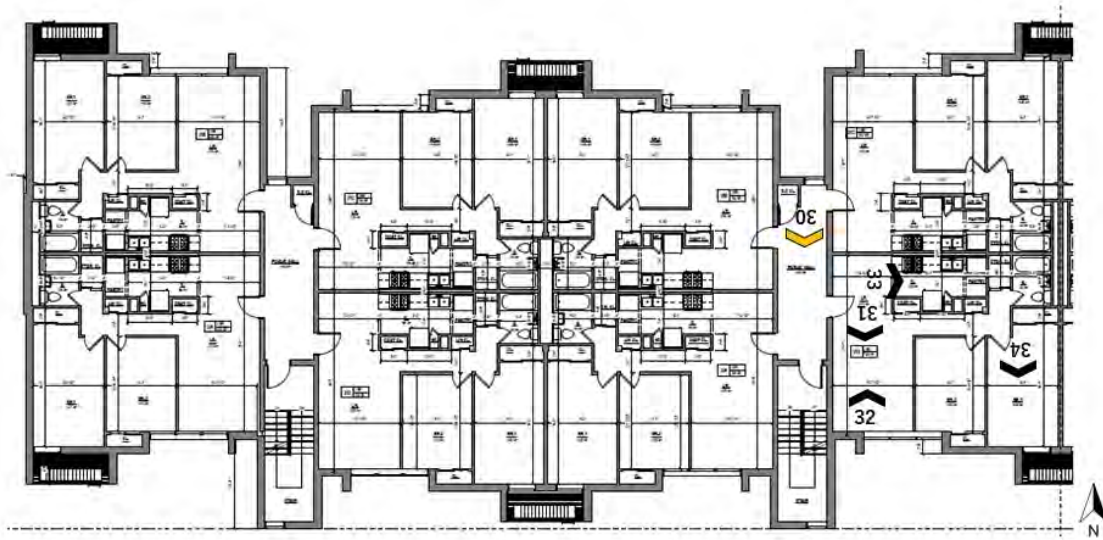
Block 5 - 875 Stuyvesant Avenue Photo Key Plan, Third Floor
